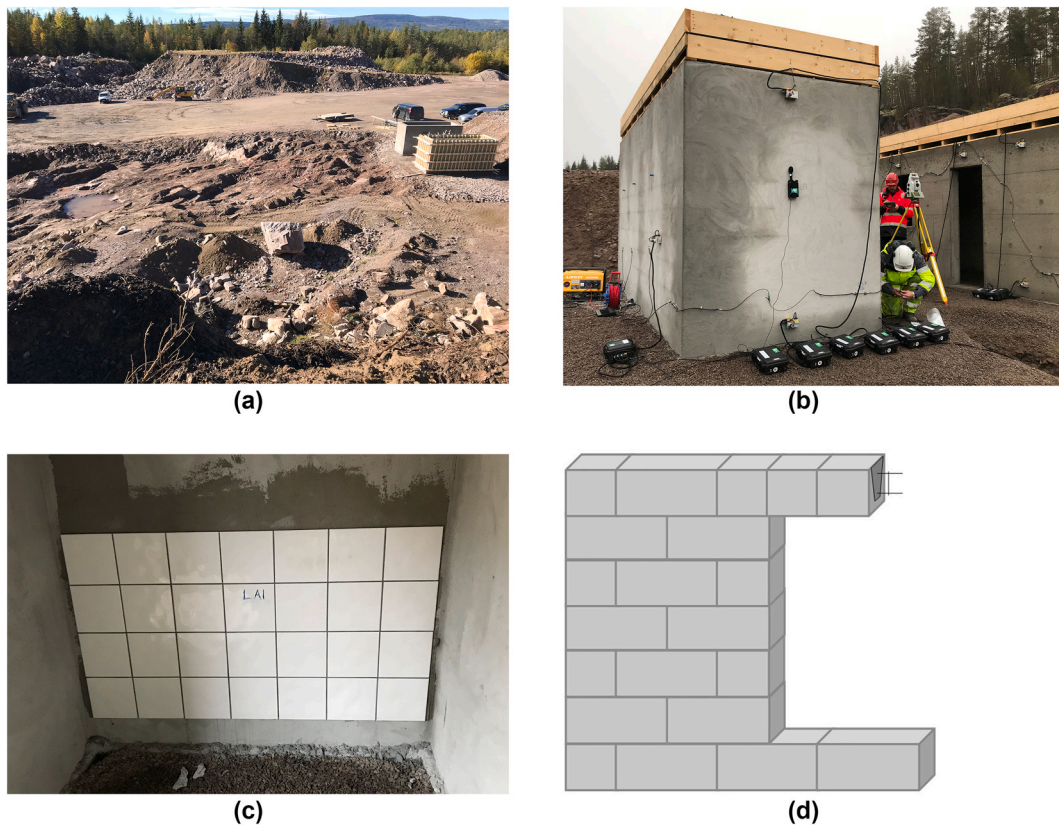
a) Test area (left) and test buildings (right). The cast-in-place concrete building is under construction. b) Instrumented test buildings, LECA (left) and concrete (right). c) Tiles on the inside of the LECA building. d) U-blocks with reinforcement above window and door openings in the LECA building.
